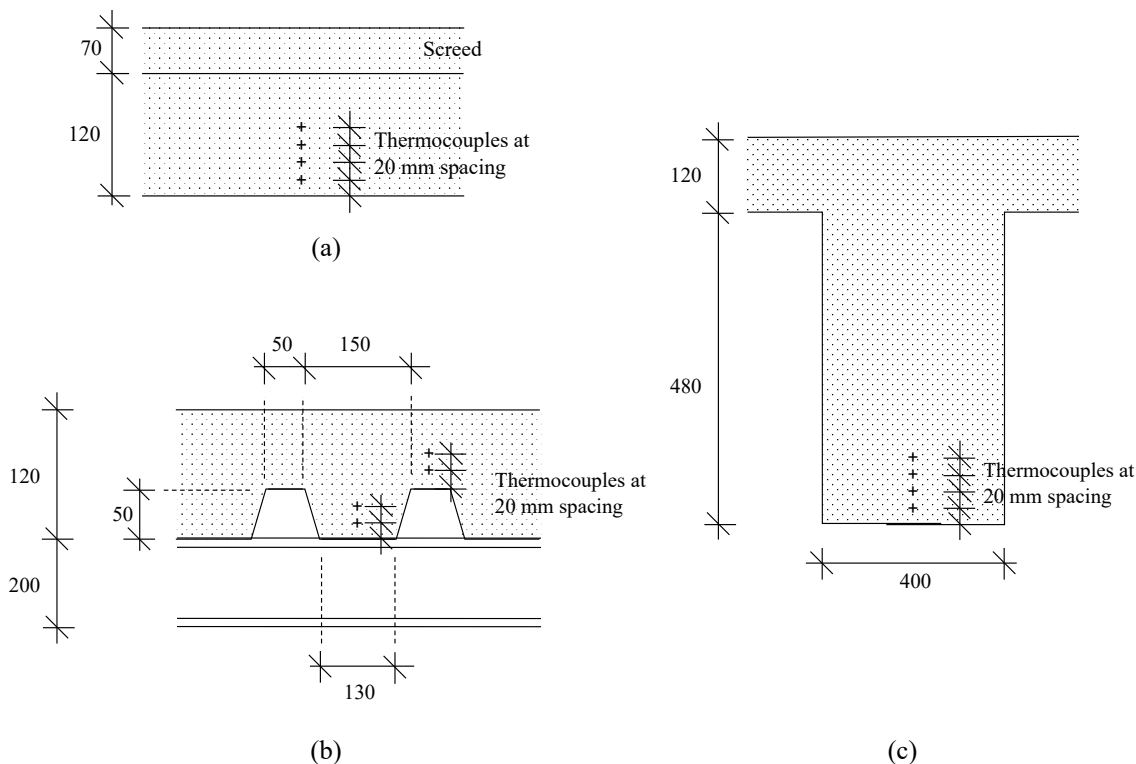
(a). Concrete slab; 4(b). Composite slab; and 4(c). Concrete beam with recorded thermocouple positioning, all measurements in mm.
